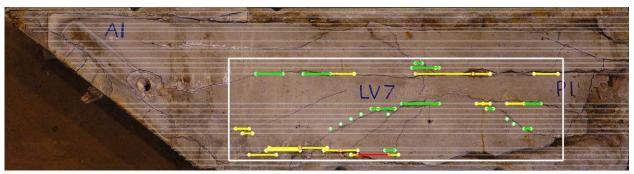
Damage Profile for Lakeview Drive Bridge Beam 7
